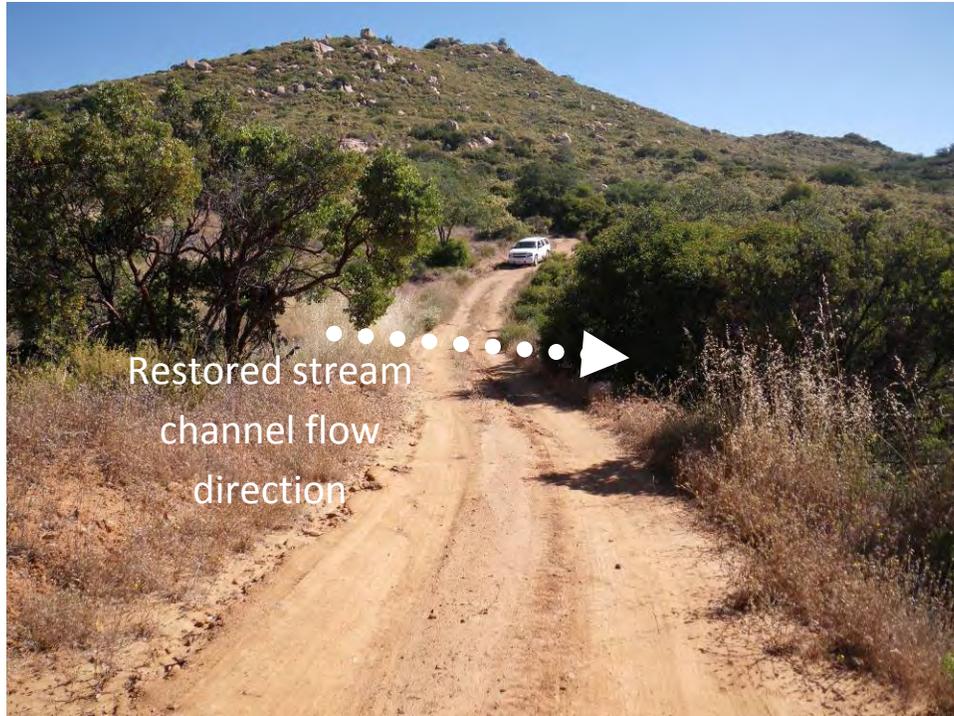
View of existing road crossing at Site 11. Removal of road will re-connect the upstream and downstream reaches of this ephemeral stream channel, in addition to re-focusing the headwater drainage to the stream channel.
